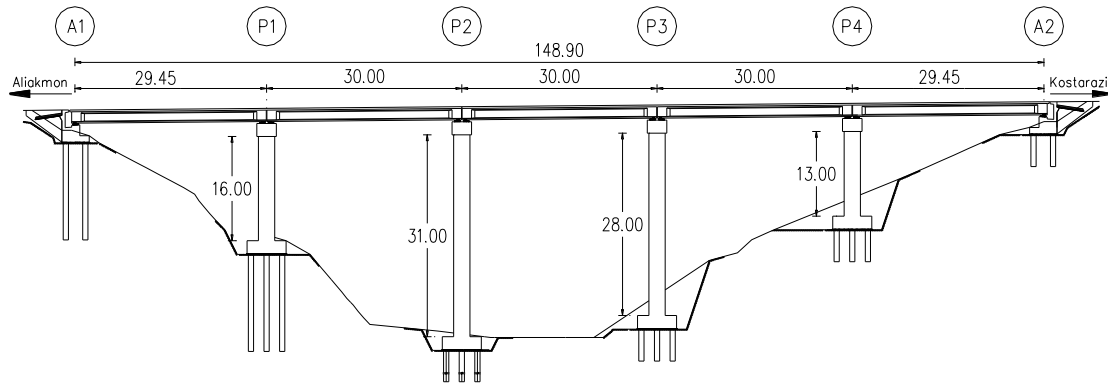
Longitudinal section of the benchmark bridge (Aliakmon-Kostarazi bridge of Egnatia Motorway)
